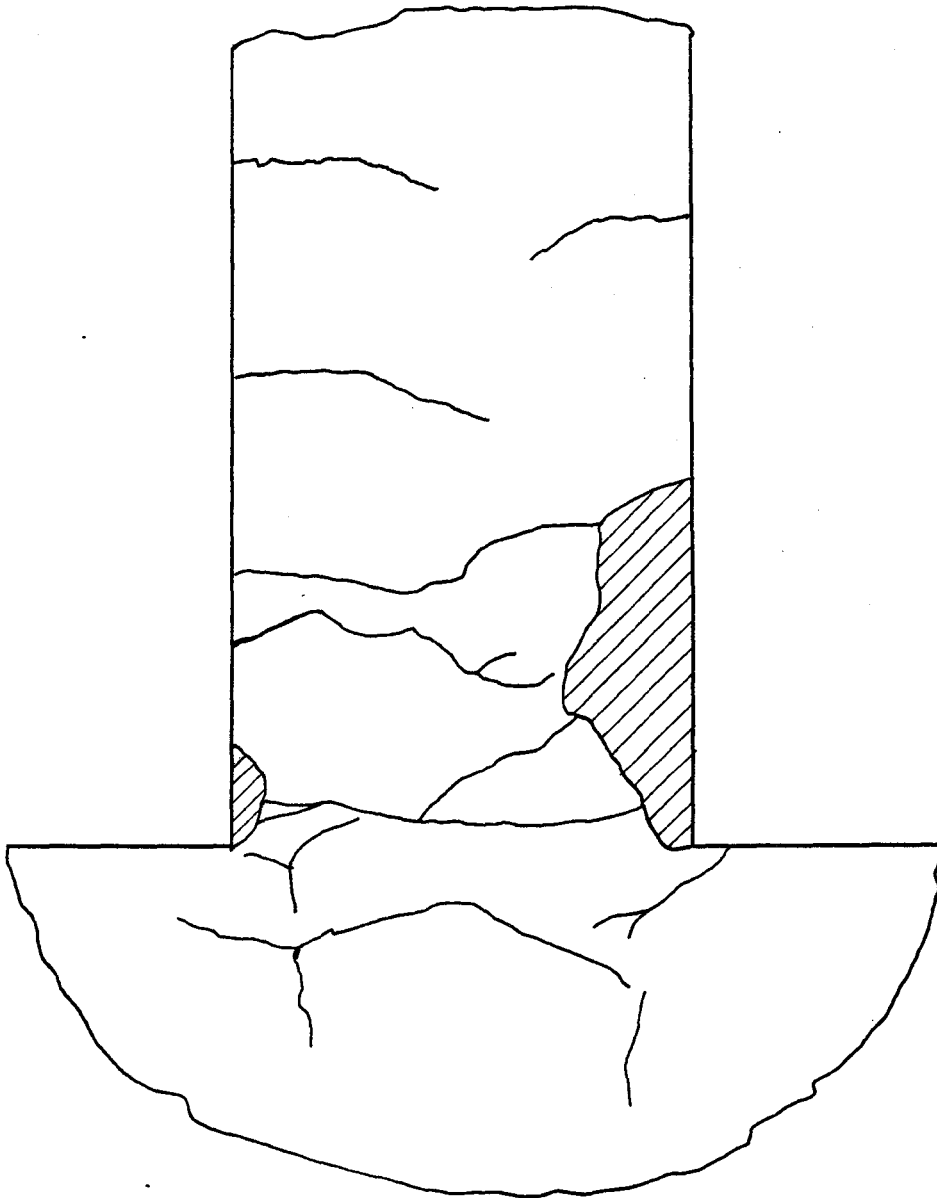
(b) Crack Pattern South Face, Specimen L4D3
